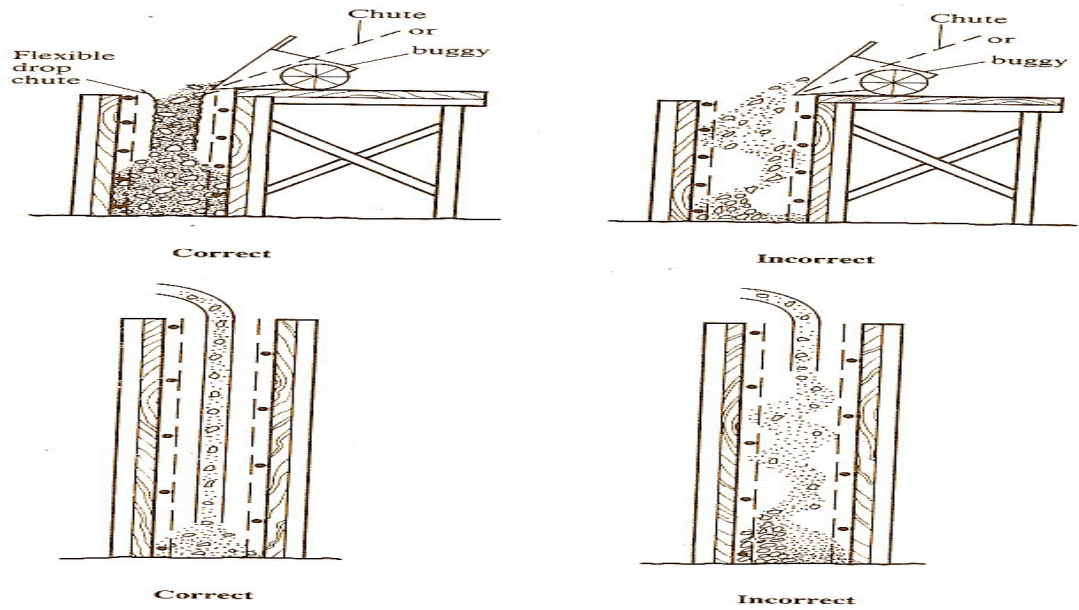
Placing concrete in a deep wall (based on ACI Manual of Concrete Practice)
